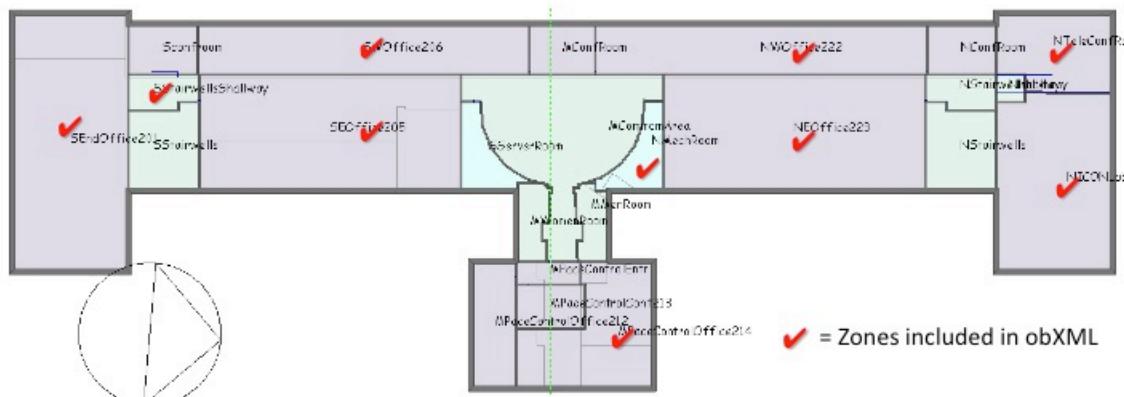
Ten zones on the 2nd floor of Building 101 that are included in obXML
